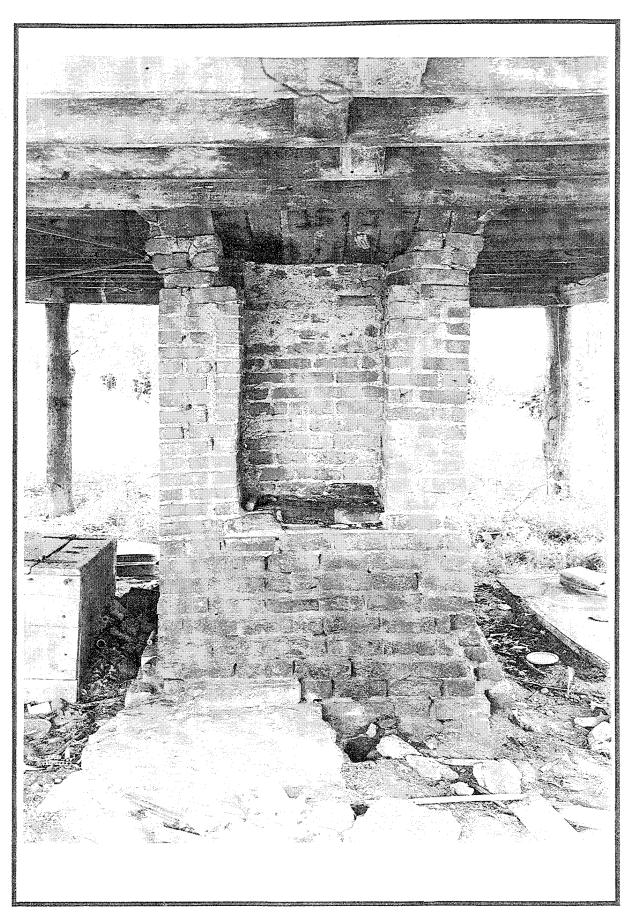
View of Chimney under the Section Foreman's Structure, Note Indentation.
